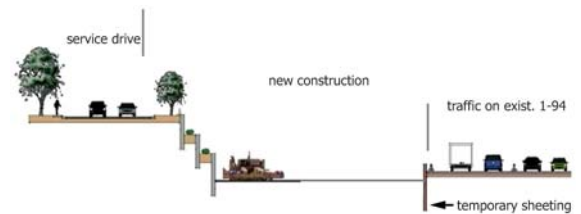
Maintaining Traffic on I-94 Partial I-94 Construction
